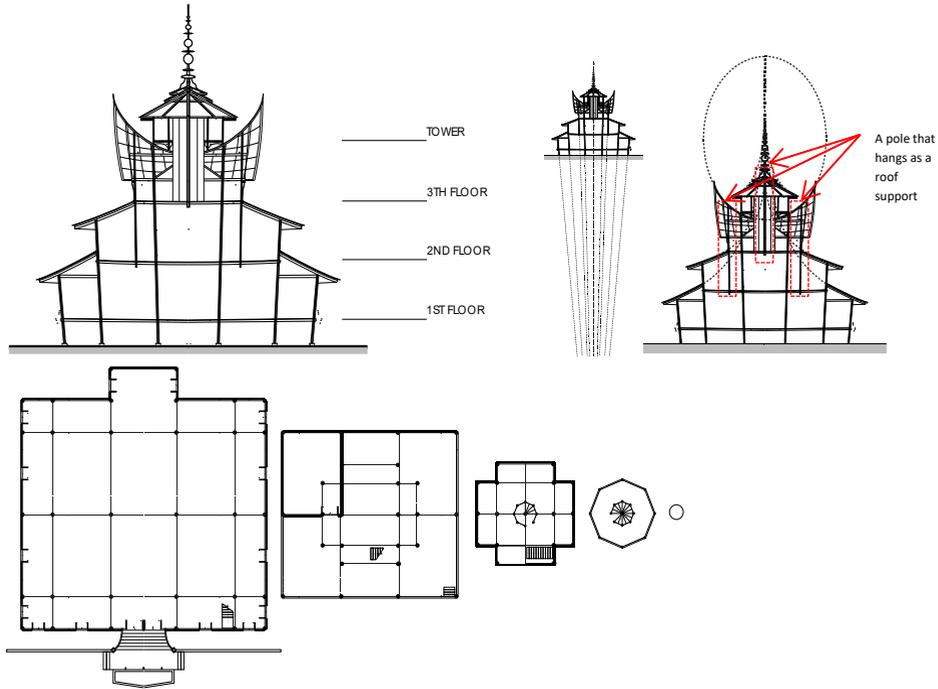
(a). Section of Surau, (b). Imaginary Line Sketches of Poles to One Point and Roundabouts to One, and (c). Floor Plan of Surau Lubuak Bauak. Source: Authors' documentation.
